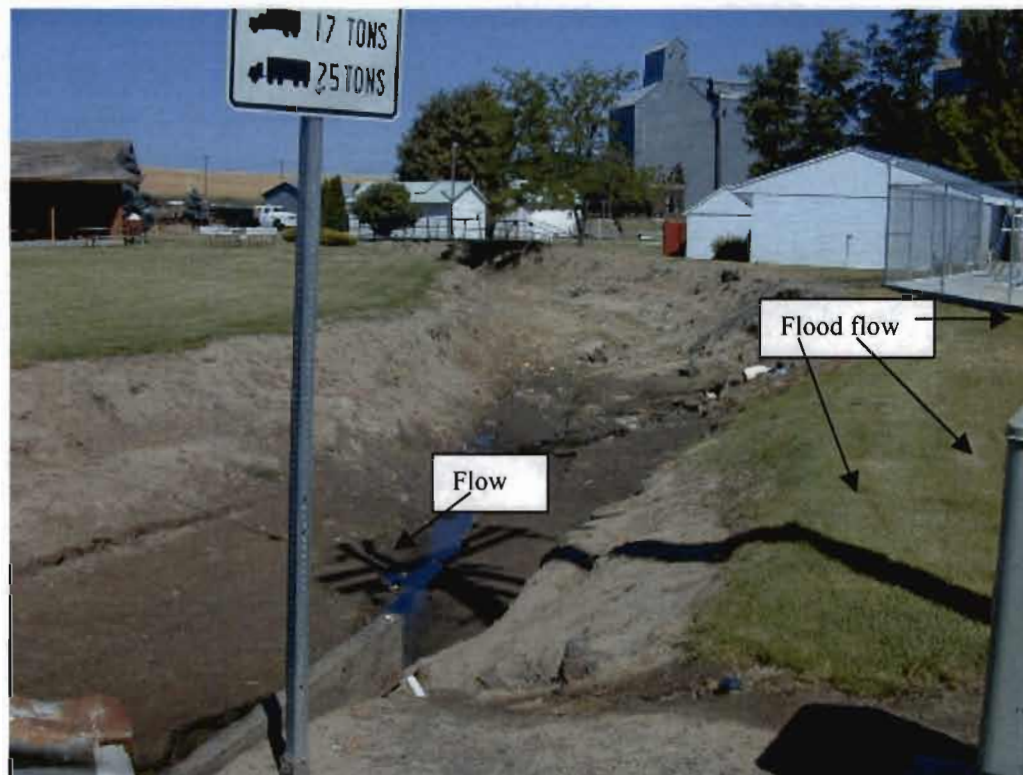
View looks northwest at Greasewood Creek upstream from bridge on road to Holdman
